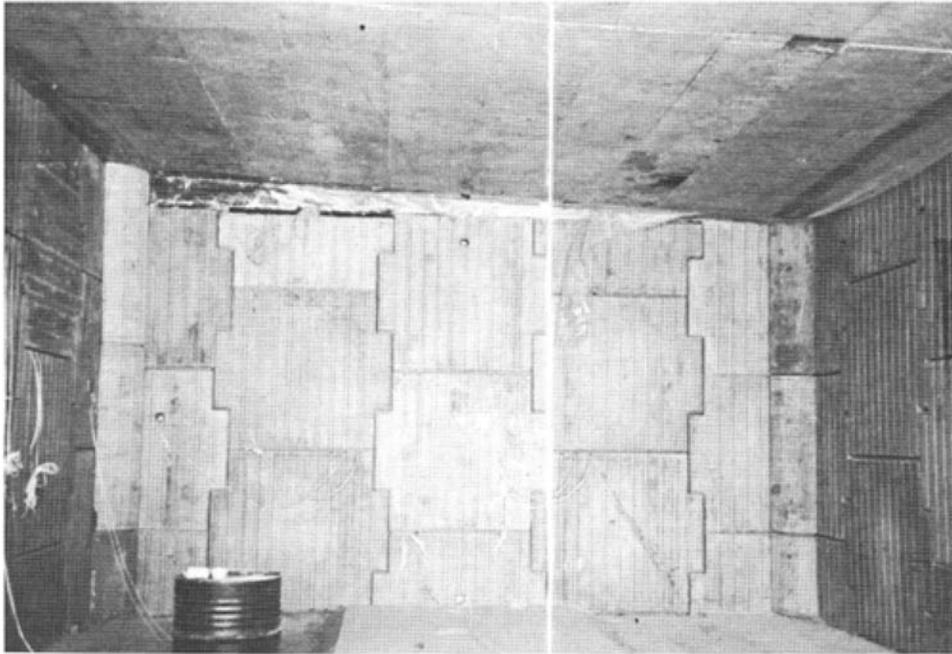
Reinforced earth concrete face elements connections for walls A, B, C
